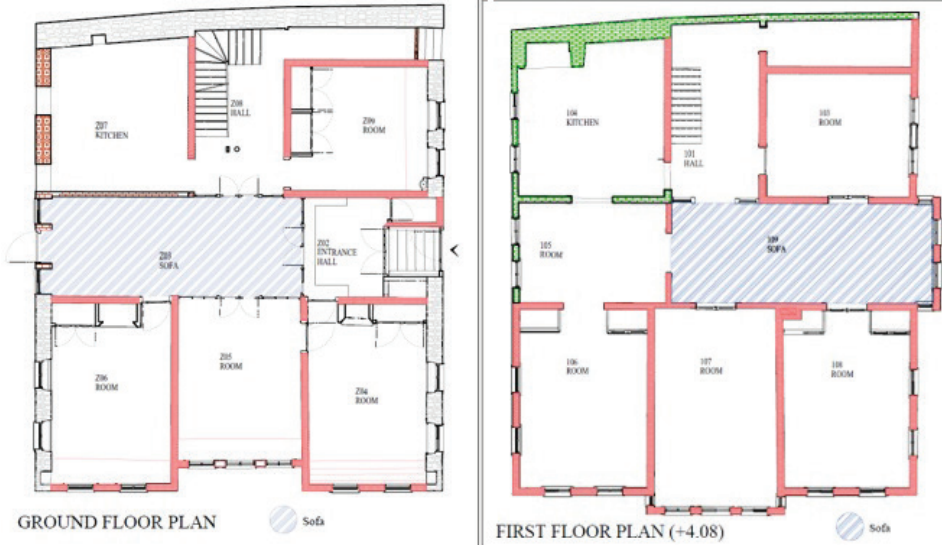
Ground floor and 1st floor plan schemes of the building. (Drawn by using Nazlı Keçeci's drawings, 2020)
